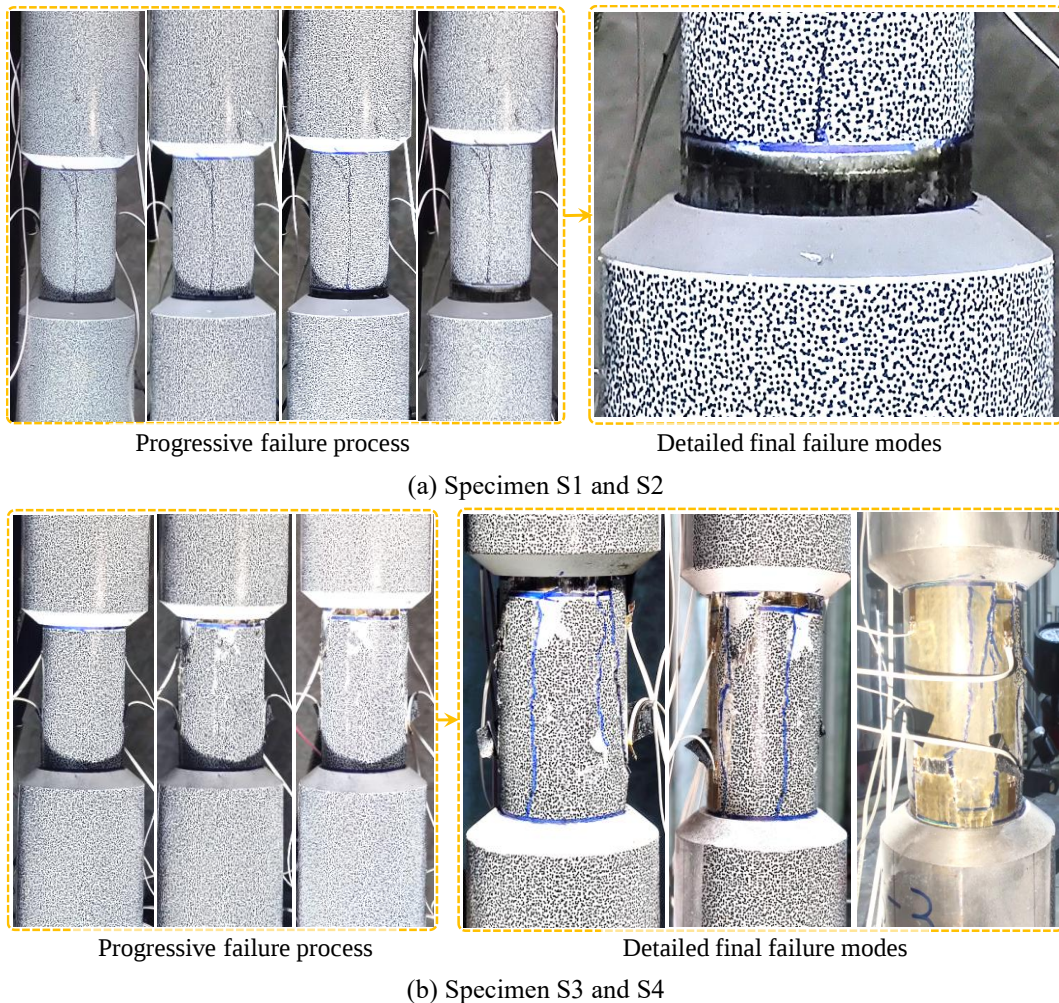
Progressive failure modes of the FRP-metal crimped thread connections.
